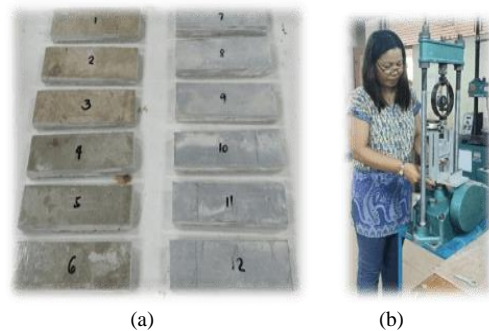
(a) Representative cut specimens and (b) Modulus of Rupture test using Manual Compression machine.
